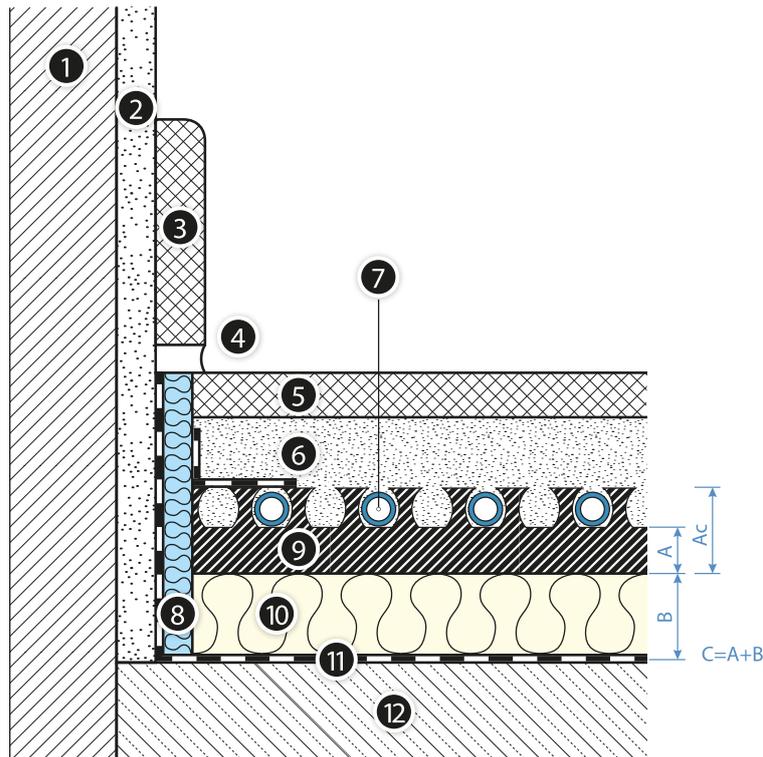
Floor heater with KAN-therm Profil System board and supplementary insulation and damp-proof coating on the ceiling laid out on the ground
